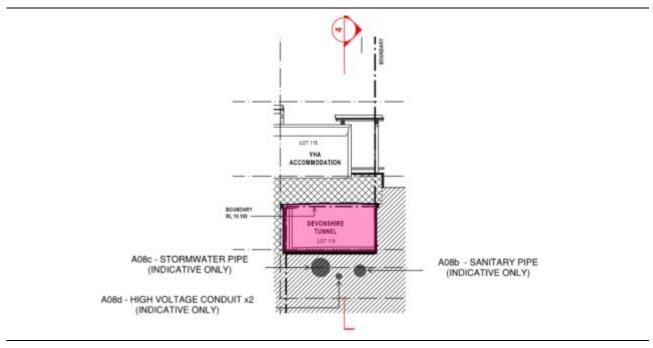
Cross-Section Elevation View of Devonshire Street Tunnel' (BVN Dwg. AR-23D-GXX-04[2])
